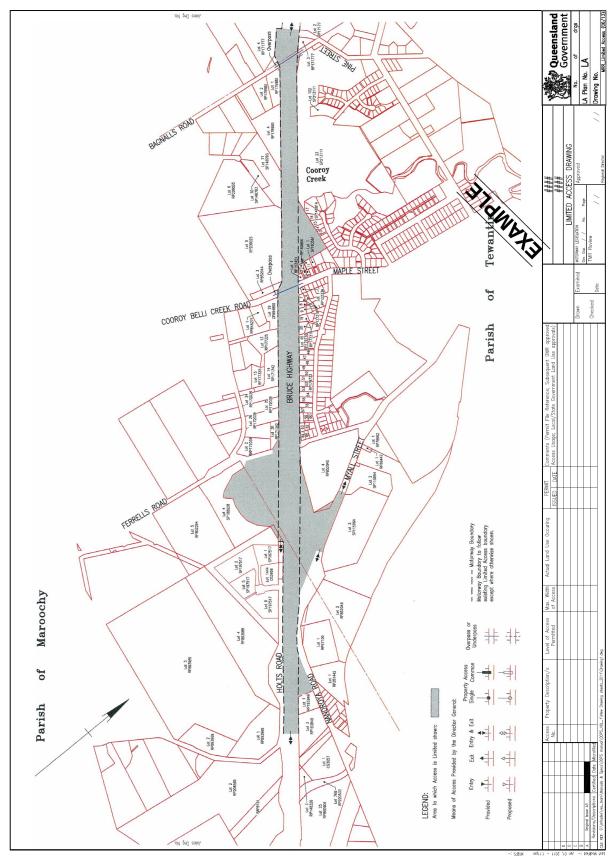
(e) – Existing limited access plan – Motorway
